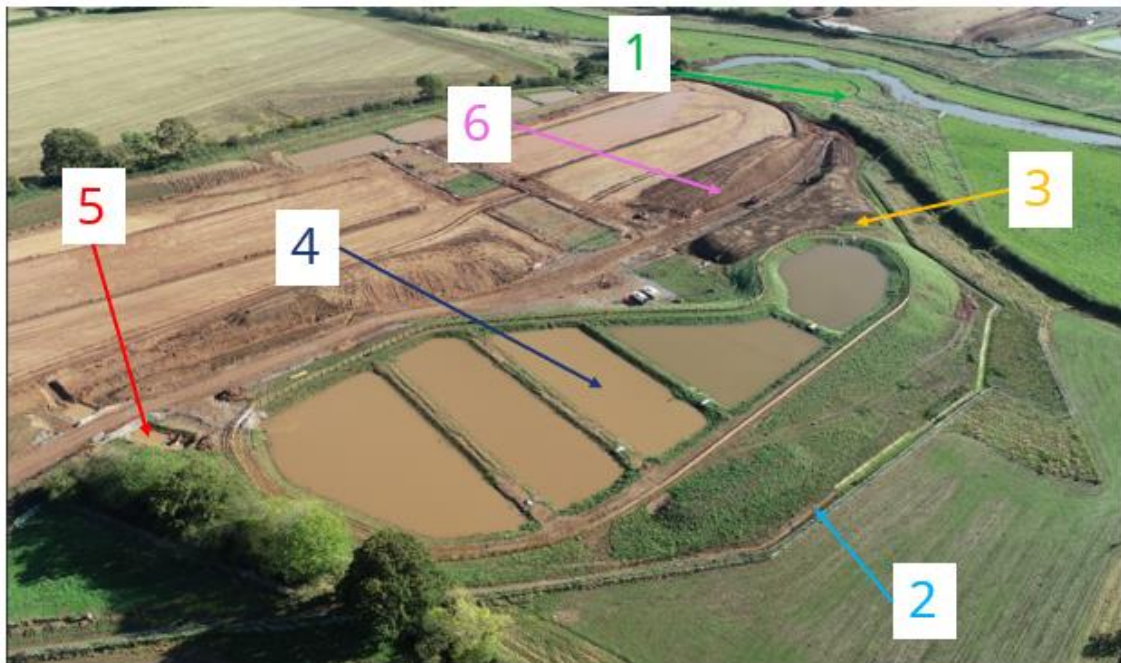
Example of a site drainage system with attenuation pond and separation cells
